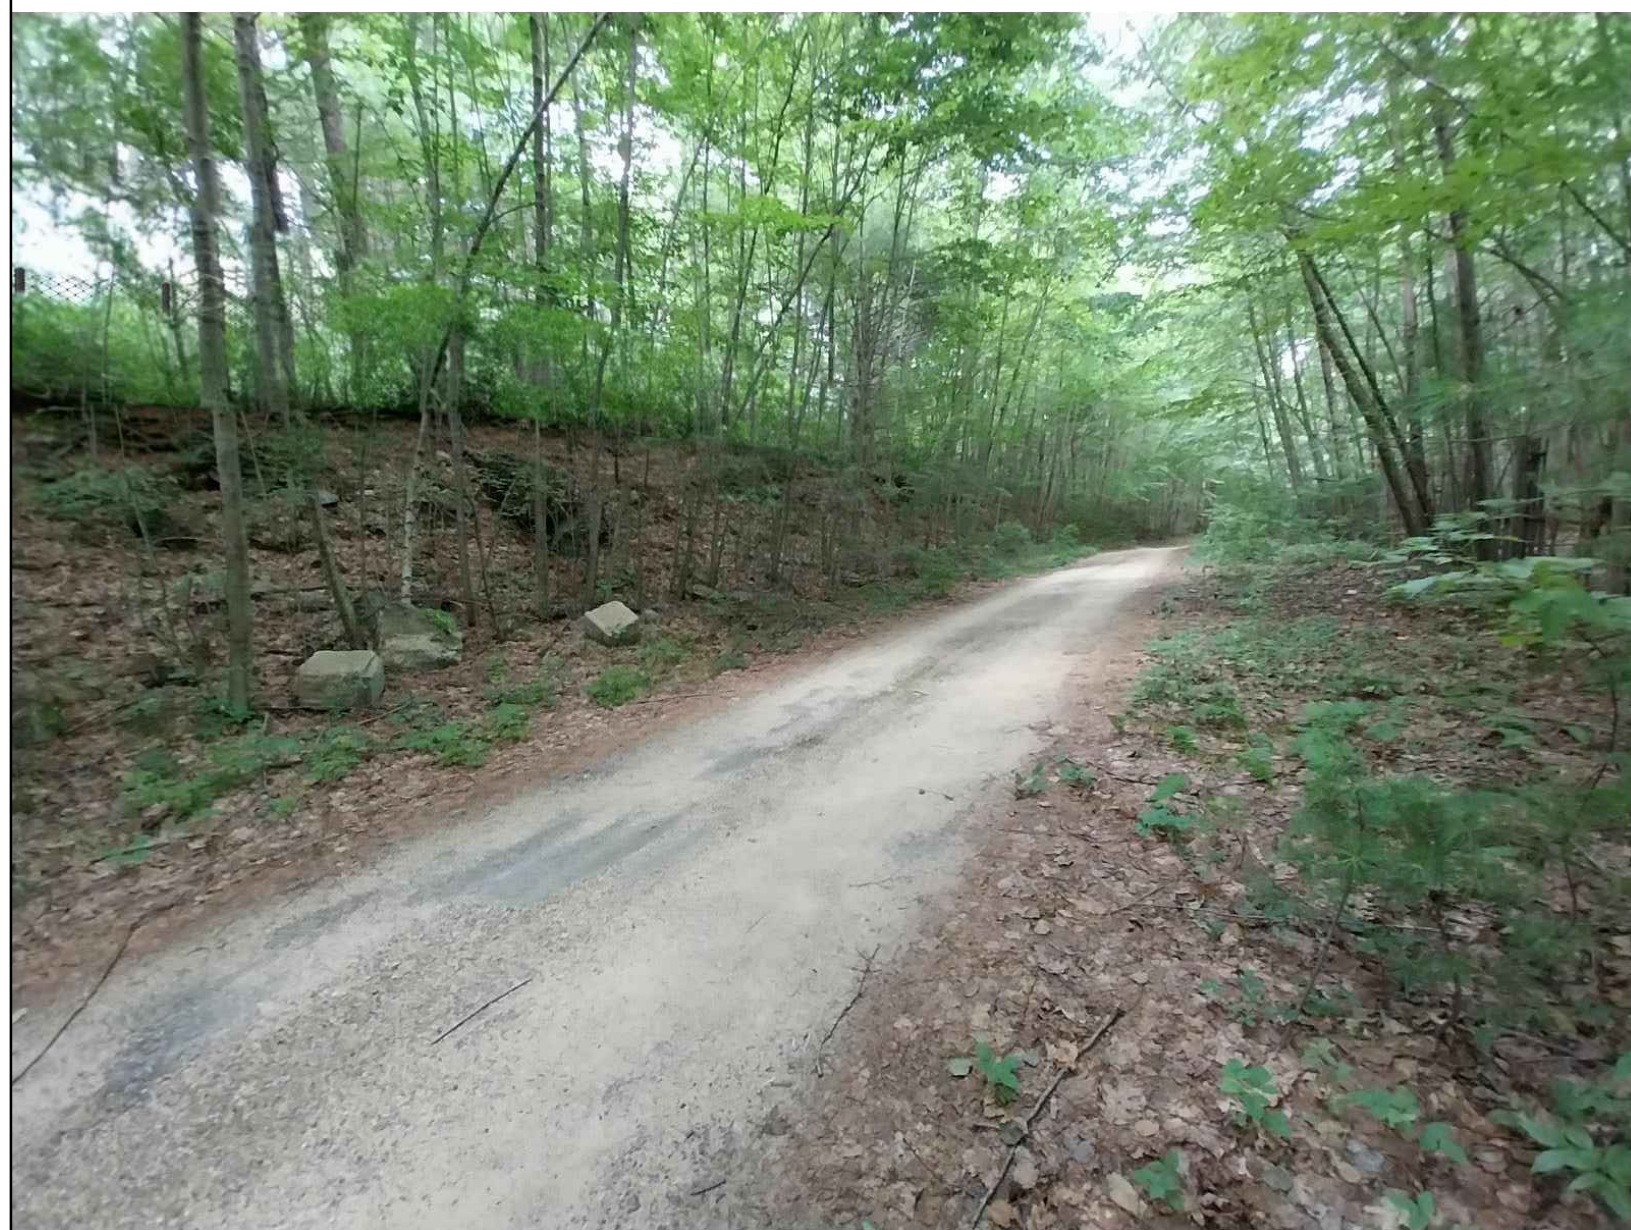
View of the existing access road off Kelly Road on the eastern boundary of the parcel. Facing south.
